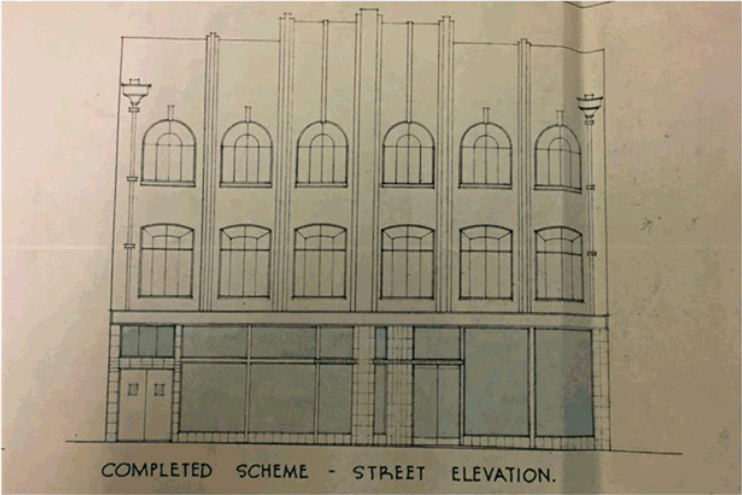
Completed scheme (TAHO, AE417/2/2054, 79 Collins Street, (13286))
